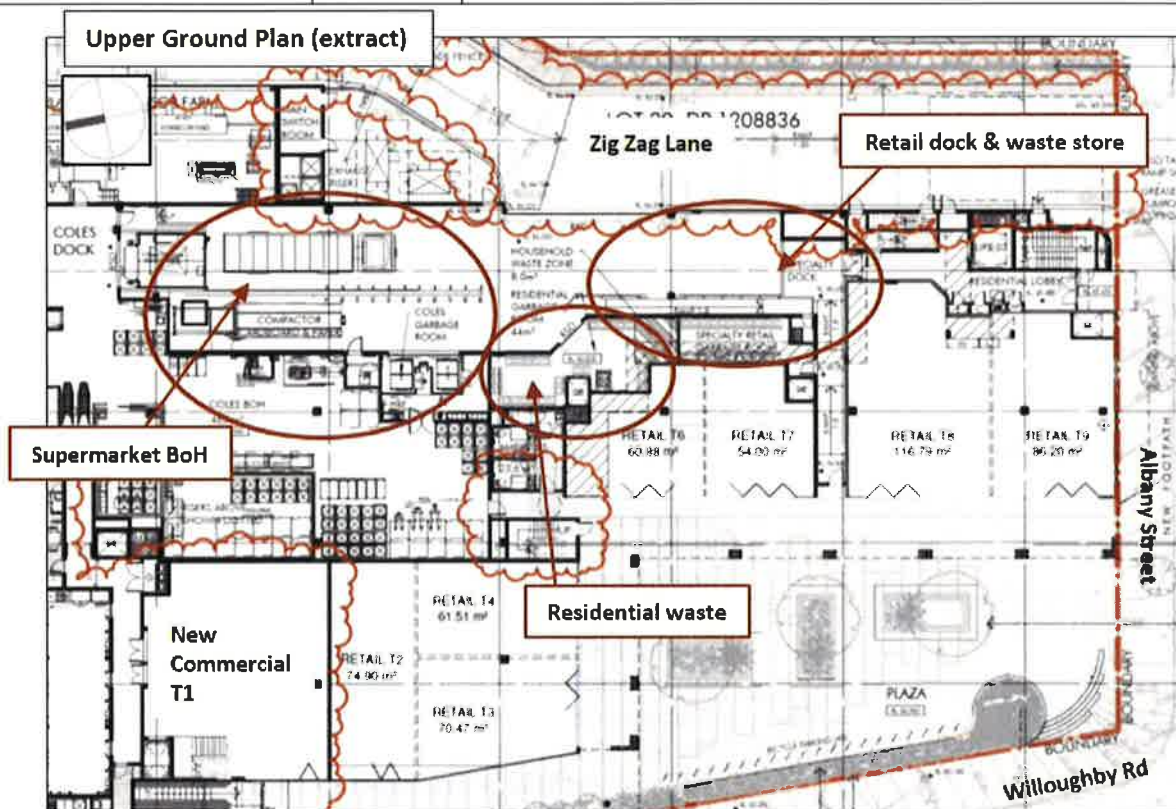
Approved supermarket, residential and retail dock & waste storage areas
